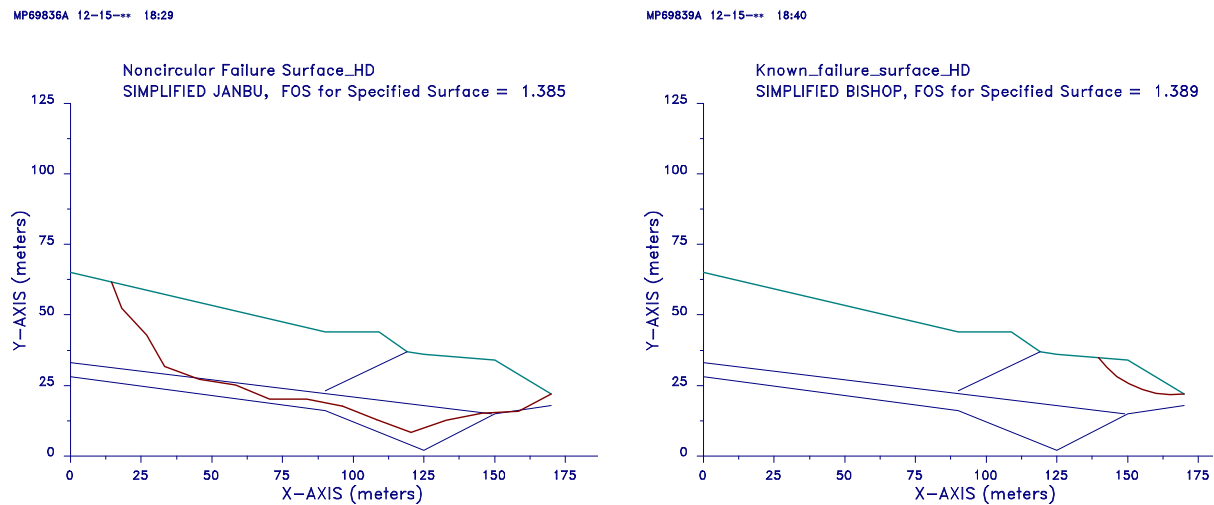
(a), (b): Improved FOS after installing horizontal drains for (a) Larger failure plane, (b) Smaller failure plane.
